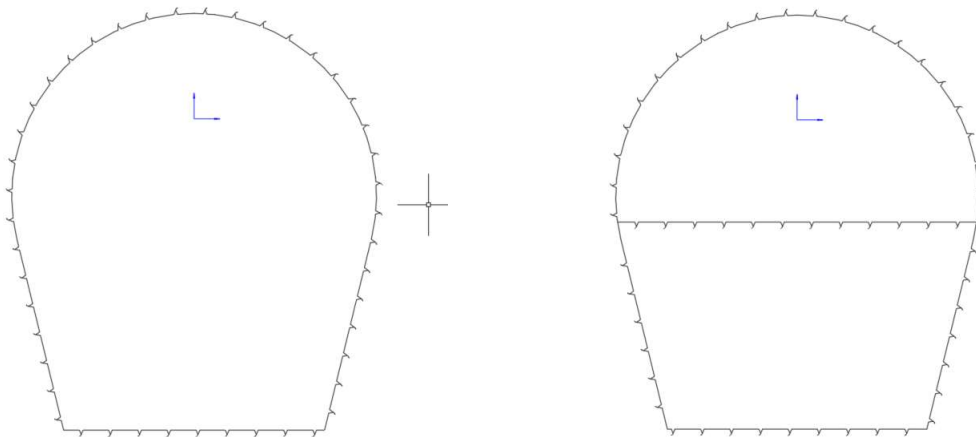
Tunnel type 2 - Full face or phase 1 and 2 excavation
